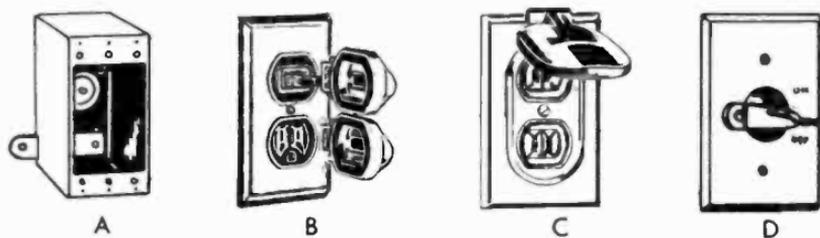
Boxes and outlets of special construction to make them waterproof. *A* is a cast metal box with watertight bushings for use with thin-wall conduit. *B* and *C* are outlets and covers. *D* is a water proof switch.
